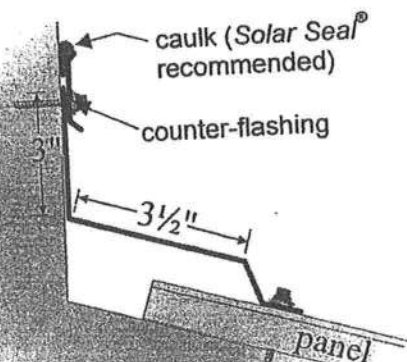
As with the ridge cap, the ENDWALL FLASHING above can be sealed using outside closures.
